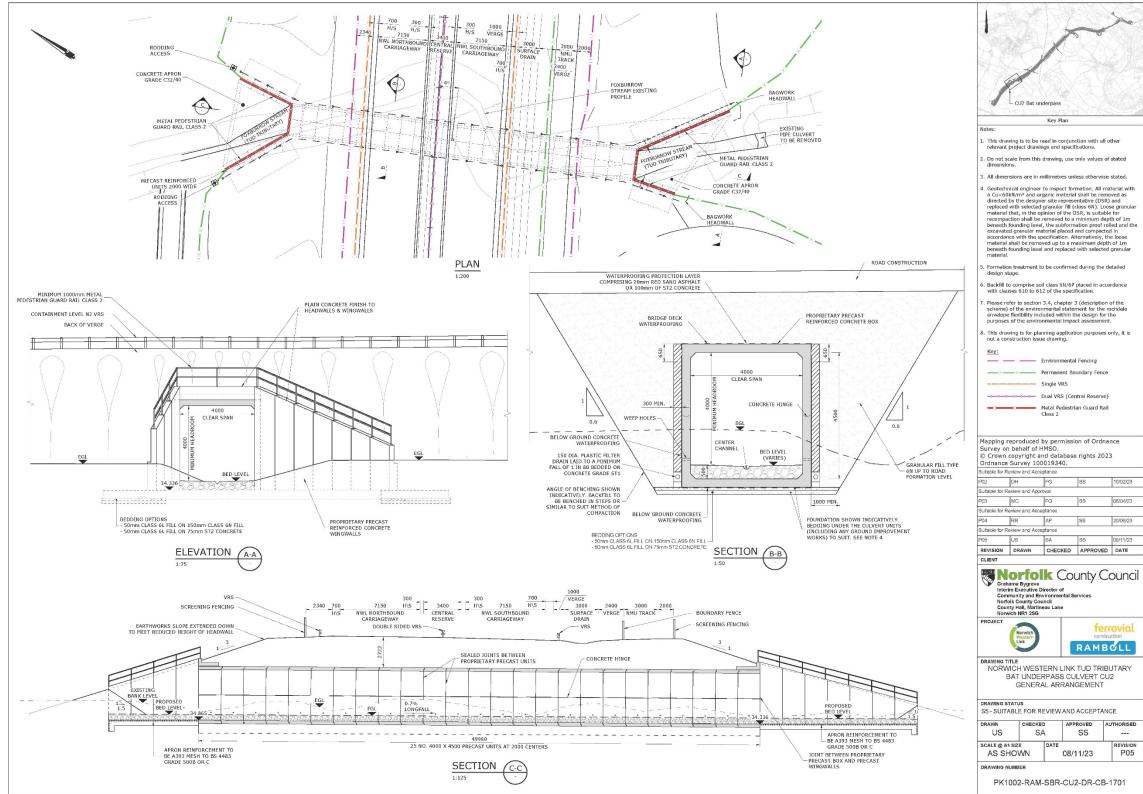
The General Arrangement Drawings for The Tud Tributary Bat Underpass Culvert CU2, illustrating the structural cross section of the underpass
